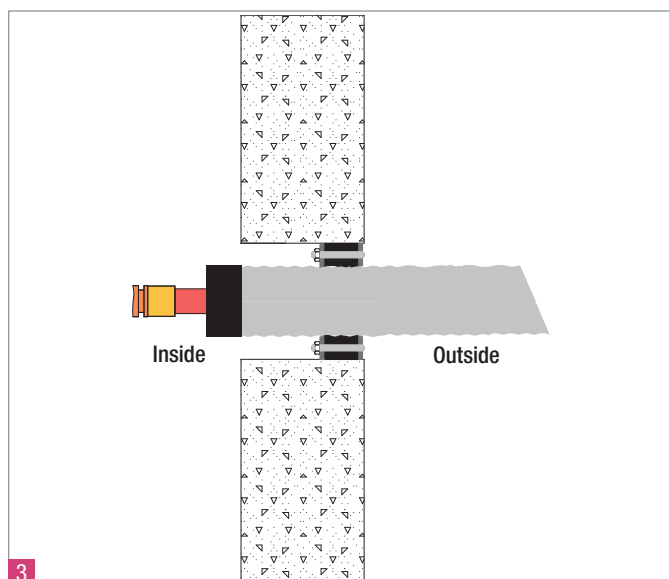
Compression wall seal FA 40 single, for water not under pressure, side view
